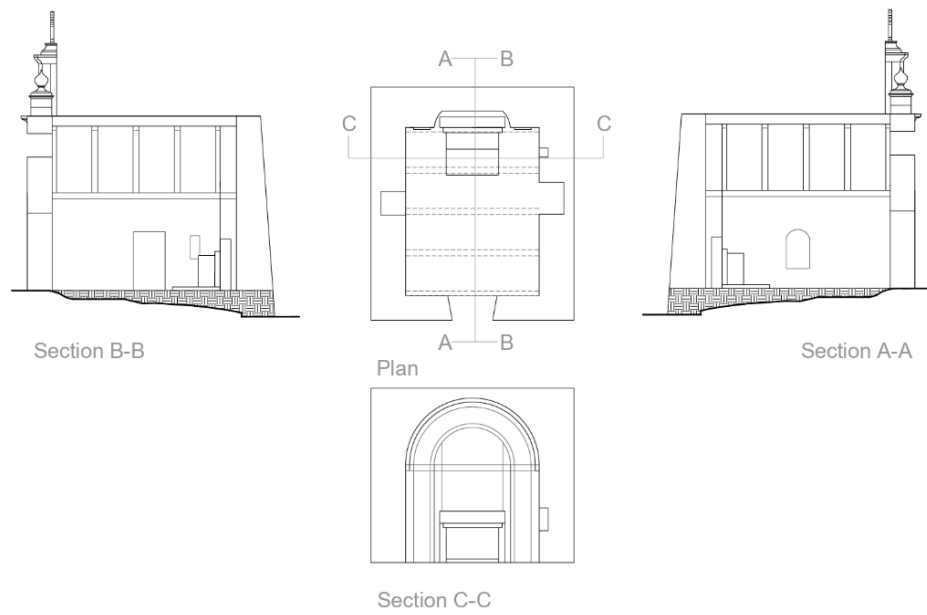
Plan and Sections of Chapel of St Philip and St James, tal-Propostu. (Author,2024)
